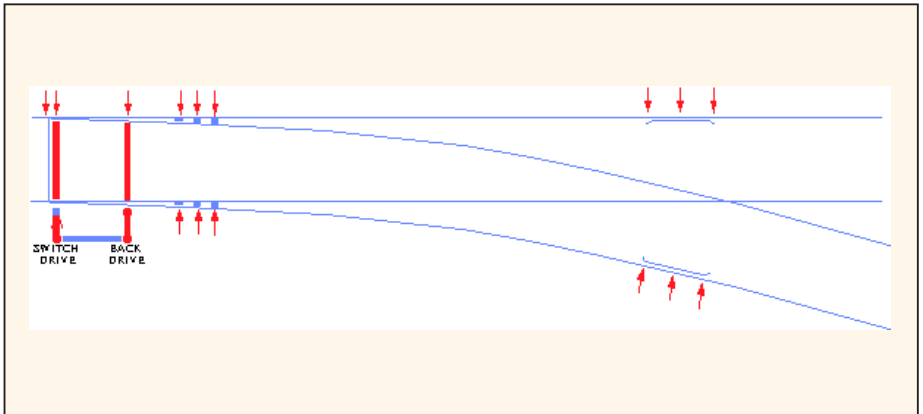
These are the minimum locations for gauge checks in S&C during routine inspection
